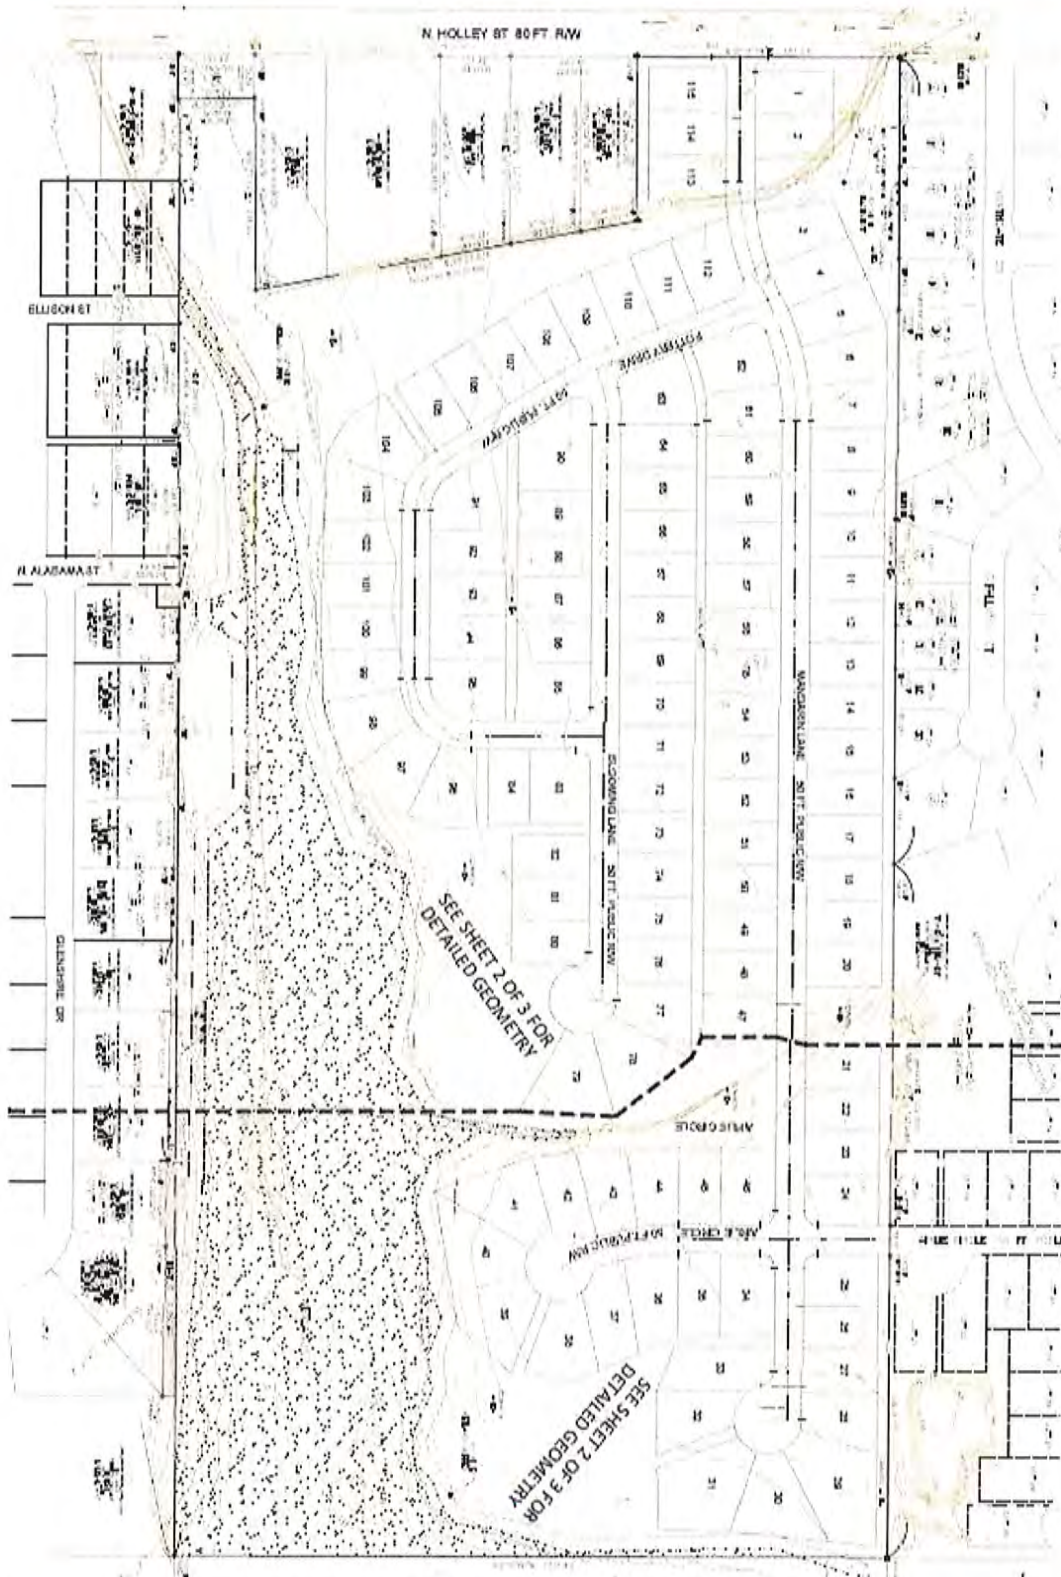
Holley Street (Azalea Gardens Ph 3 & 4) Site Plan
